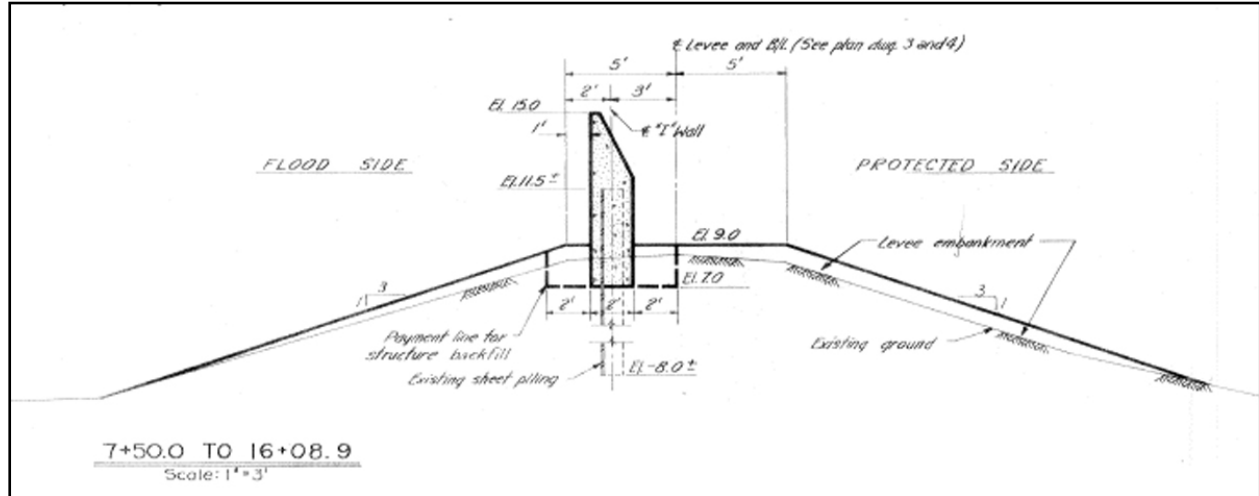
Existing Levee and I-Wall Drawing for IHNC East. Note that scoured soil included the "structure backfill" zone (from drawing file H-4-25157, IHNC East Levee from Lock to Florida Ave. Floodwall, sheet 12 of 15)
